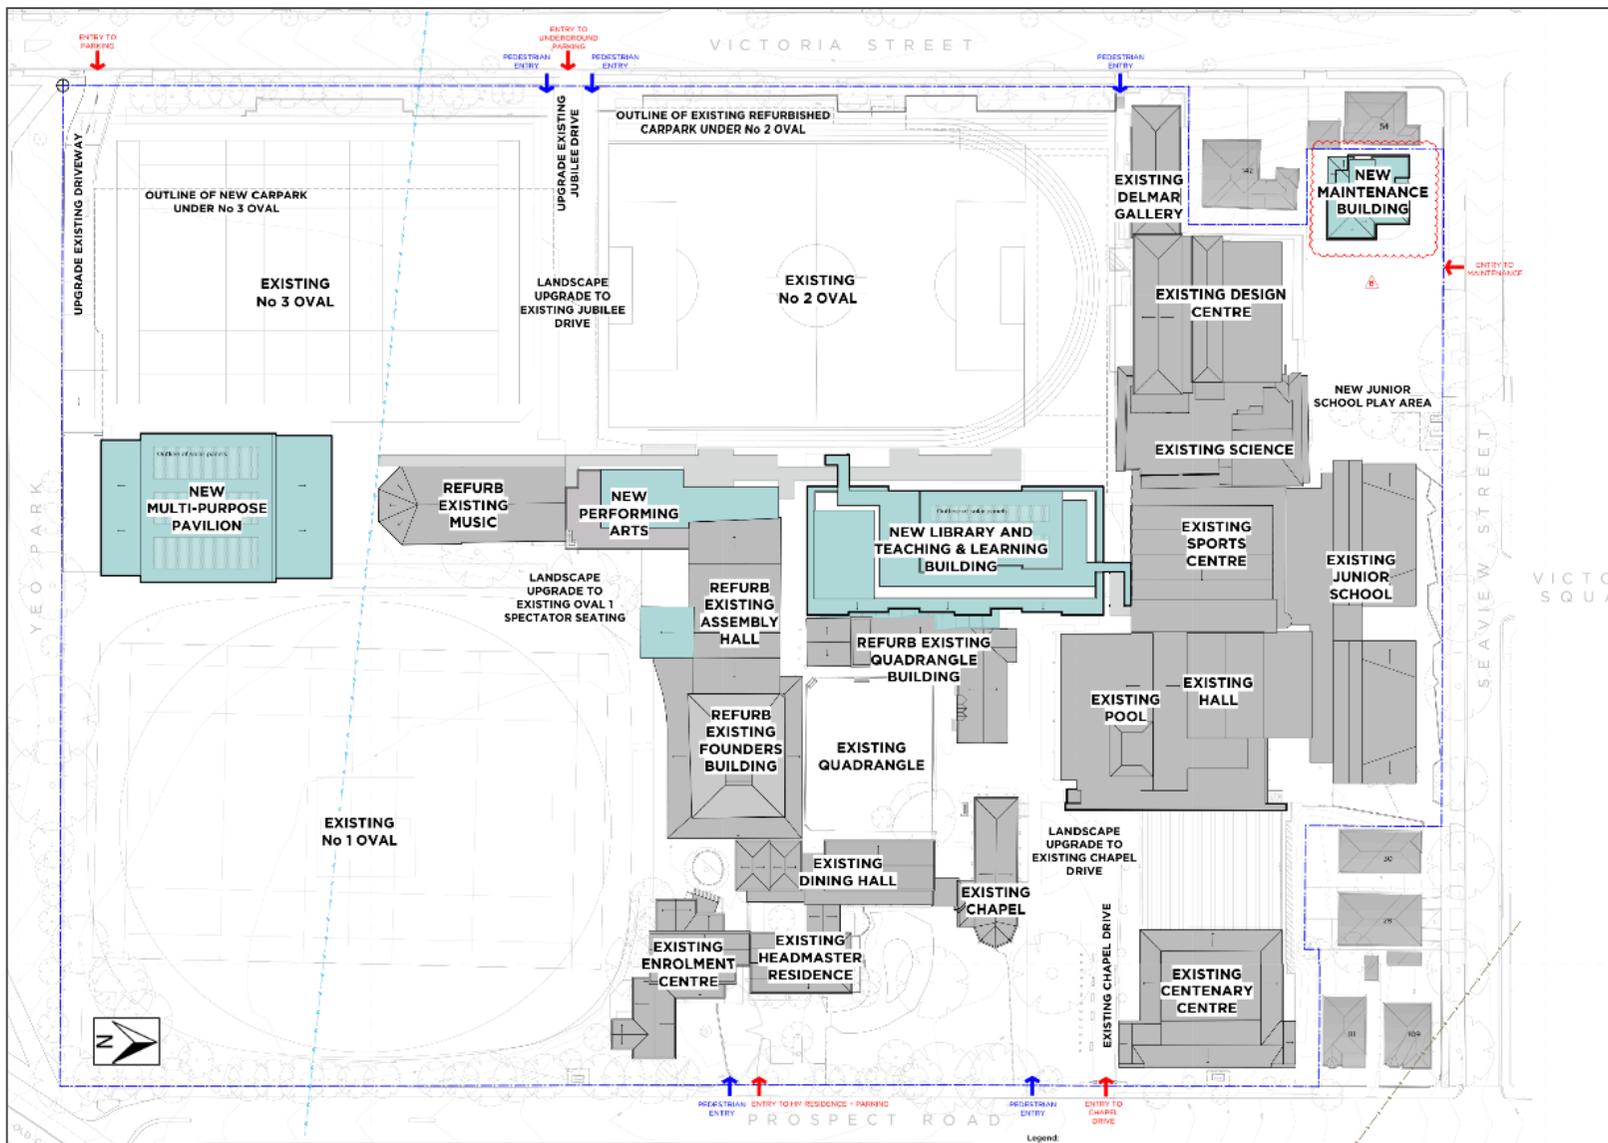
| Site plan showing location of new buildings (blue) in the context of the existing buildings (Source: Applicant's SRtS 2021)
